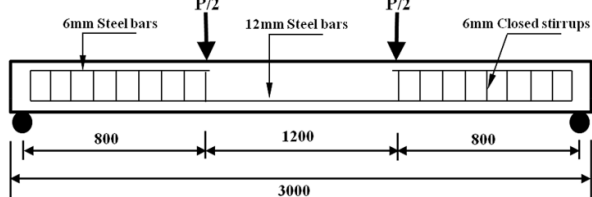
Longitudinal section of control beam (M. Abdallah [7])
